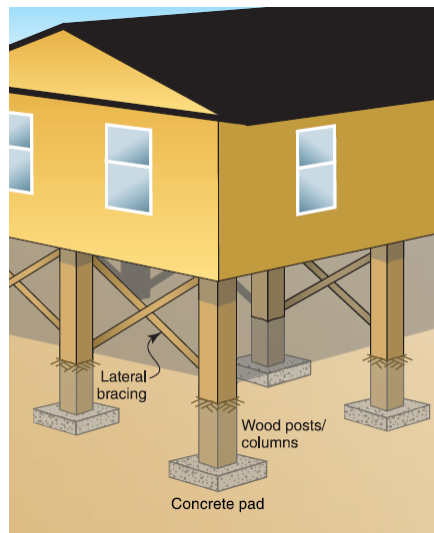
Wooden posts installed beneath an elevated structure. Each post sits in a concrete pad or footing (FEMA).
